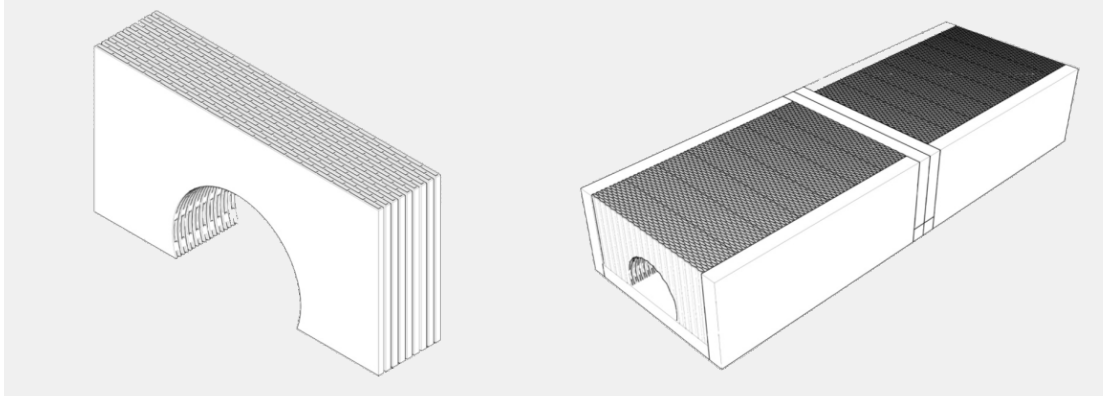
The proposed energy absorbing system and its possible use as a cushioning element in a cross-drainage culvert.
